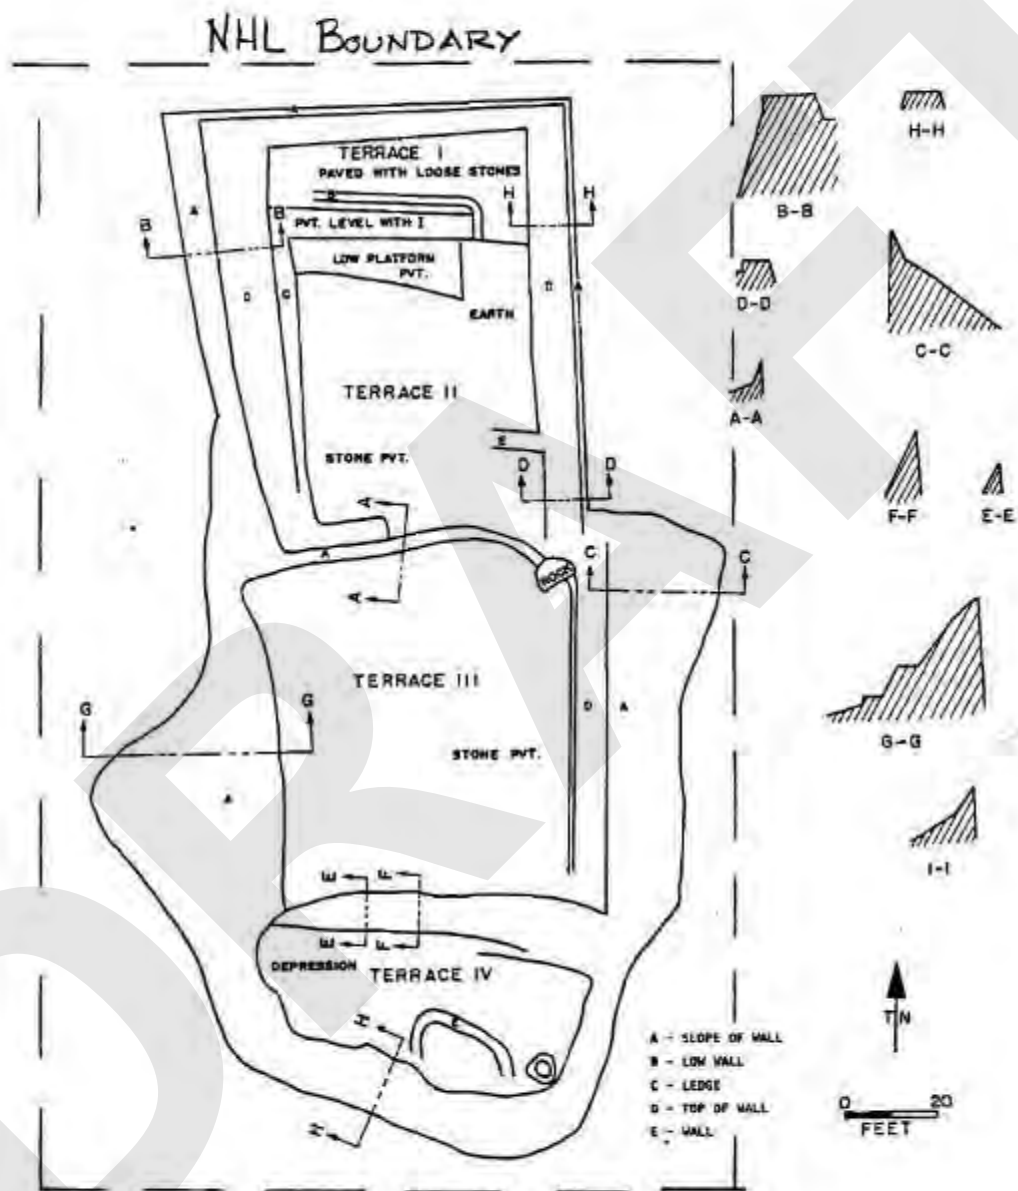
Plan and Cross Sections of Kahokukano Heiau (Plan by Stokes, 1909)
